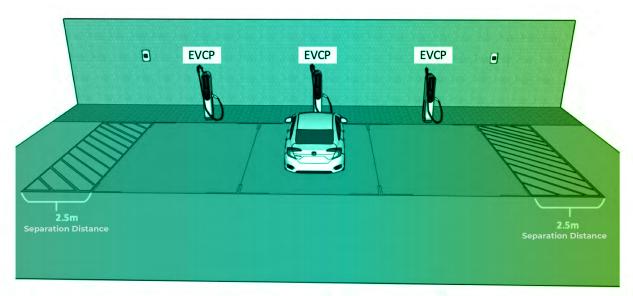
EVCB with AC chargers located outside a building must be separated by a distance of 2.5 meters from non-EV parking spaces
